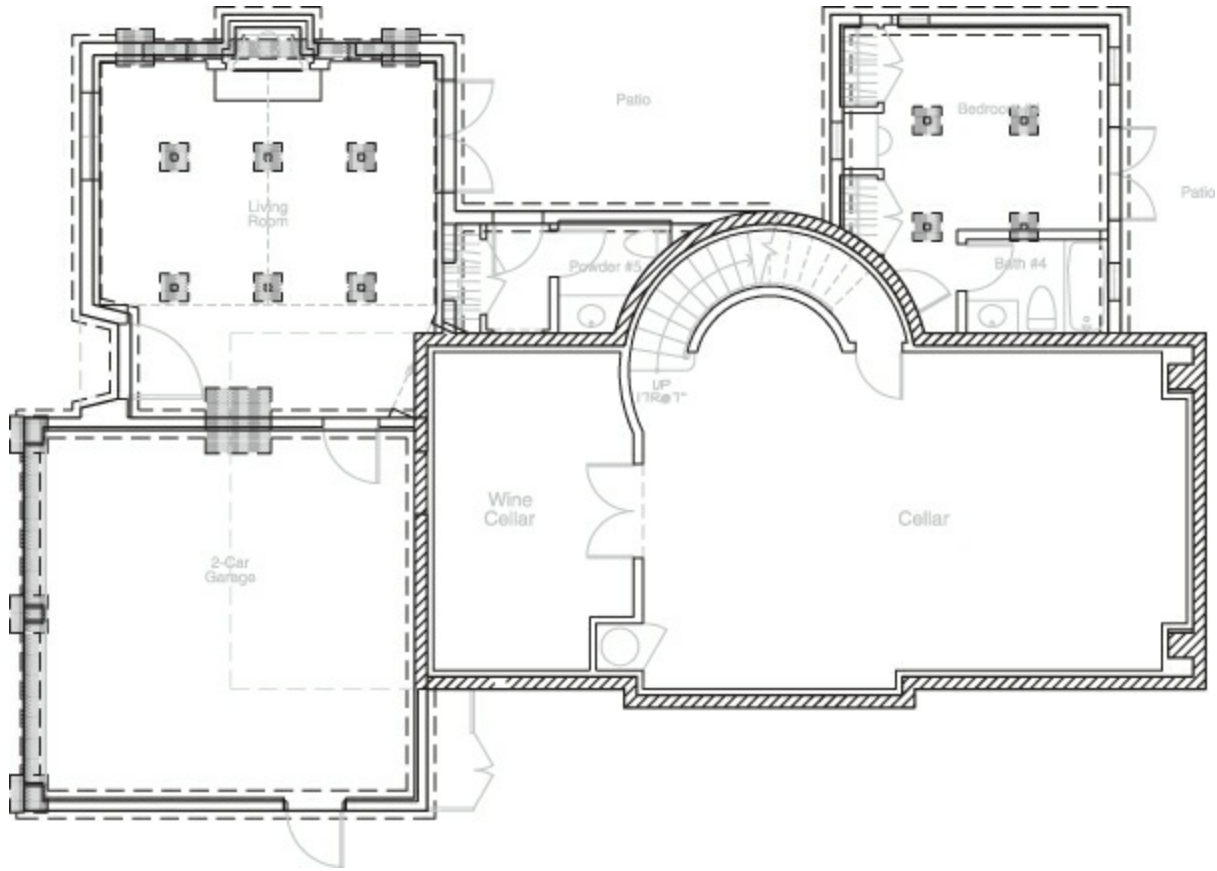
Stage I: Establishing datum (using floor plan).
